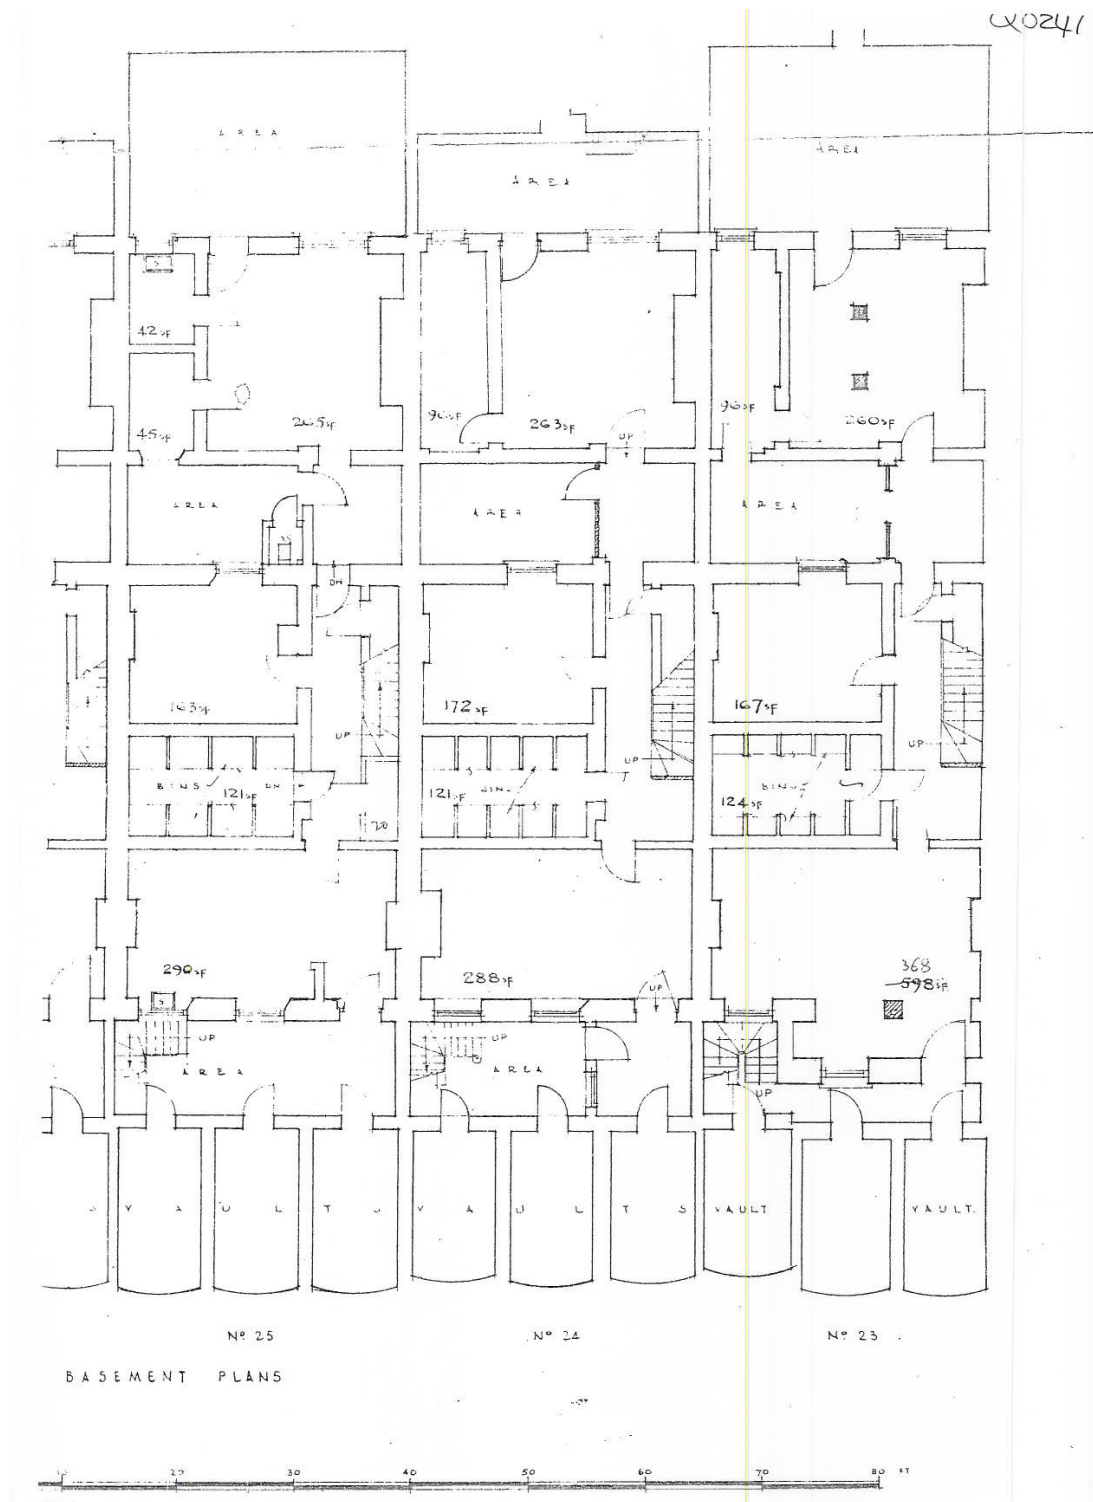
Extract from Ministry of Works Plans April 1946 Basement Plans Nos: 25 – 23 Chester Terrace – The Crown Estate Archives
